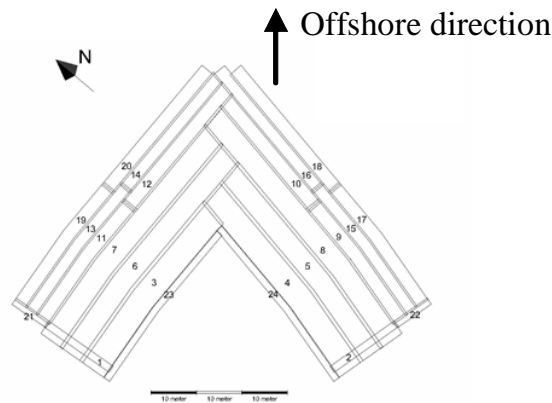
Plan view design Mount reef (source: [www.mountreef.co.nz](http://www.mountreef.co.nz)).
